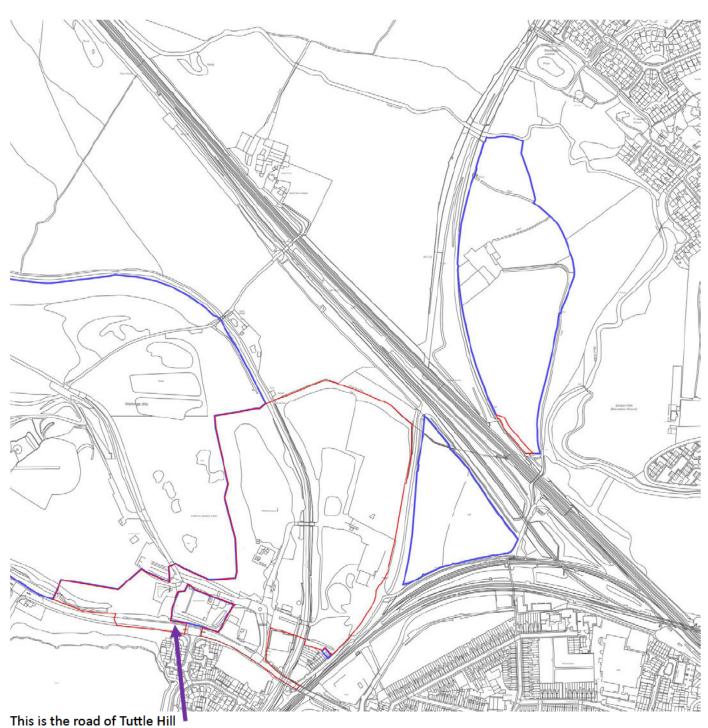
Location Plan recently submitted for planning application for the site. Council ref. 040102.
